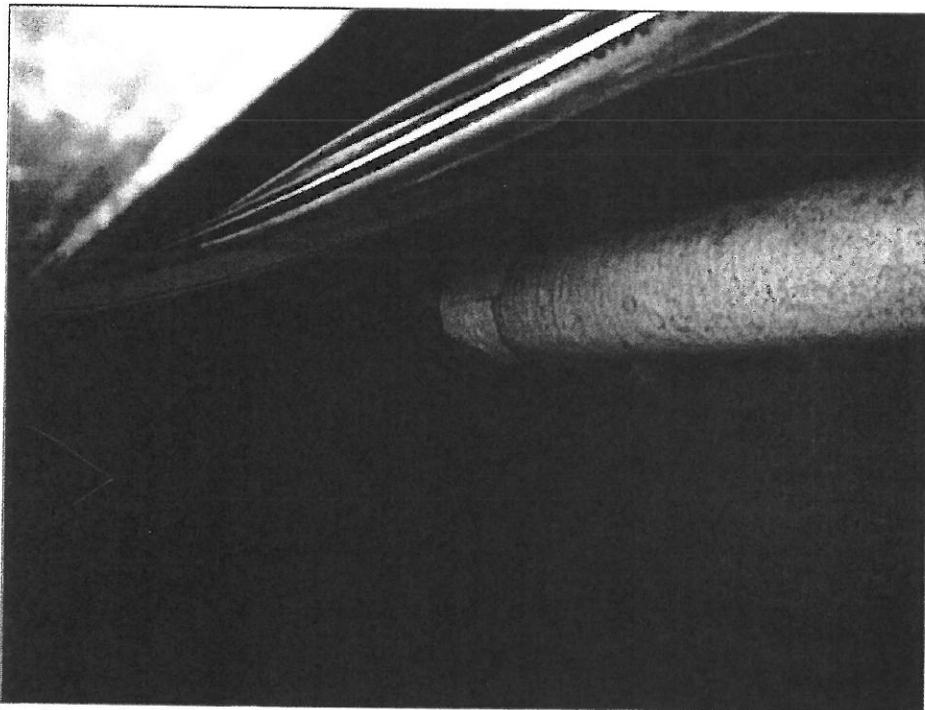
Pipe insulation above ceiling in room 26 on October 18, 2013.
